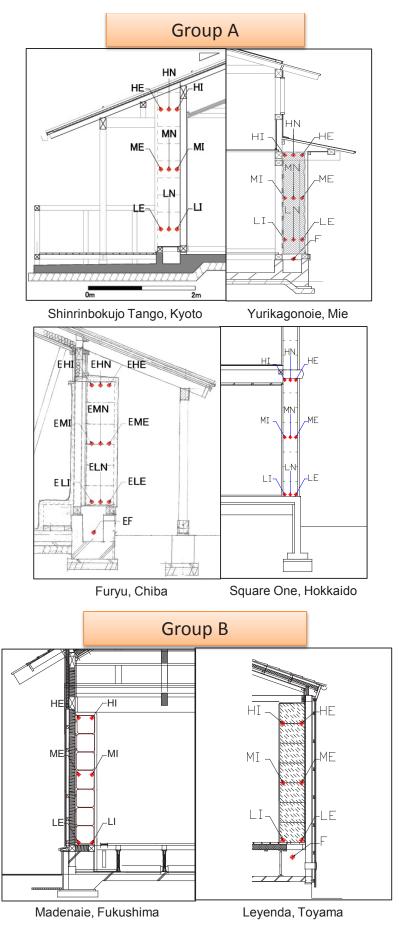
Six Straw Bale Buildings Divided into Two Groups
